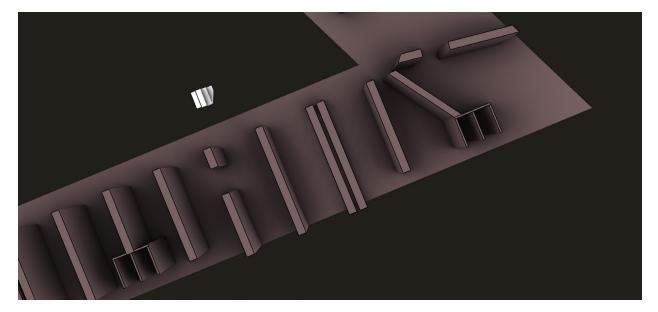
Cut Plan Animation Still 185 Figure 58 Cut Plan Animation Still 260
